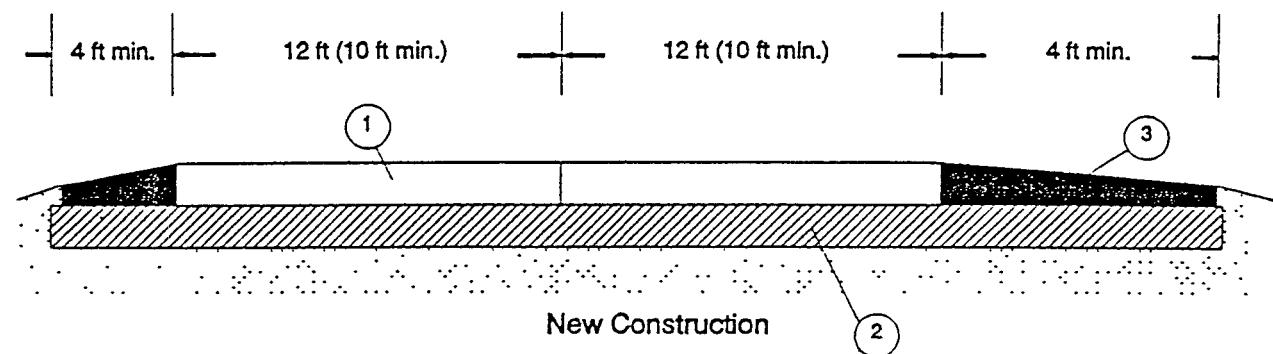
Pavement Cross Sections for Flexible Test Sections, 050803 and 050804
